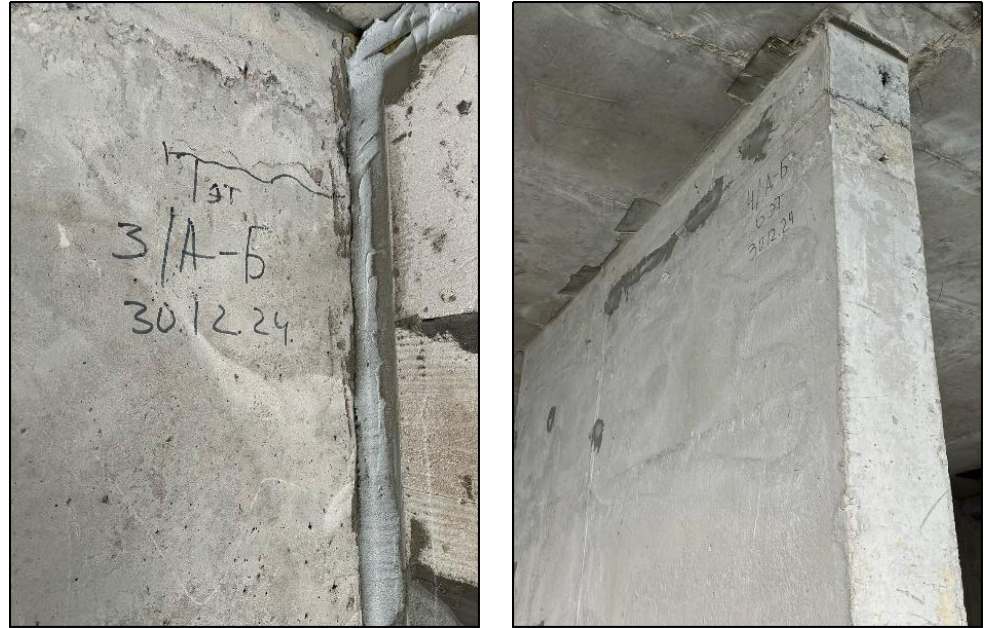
Concrete spalling at the floor and roof level, and process cracks in vertical structures.
